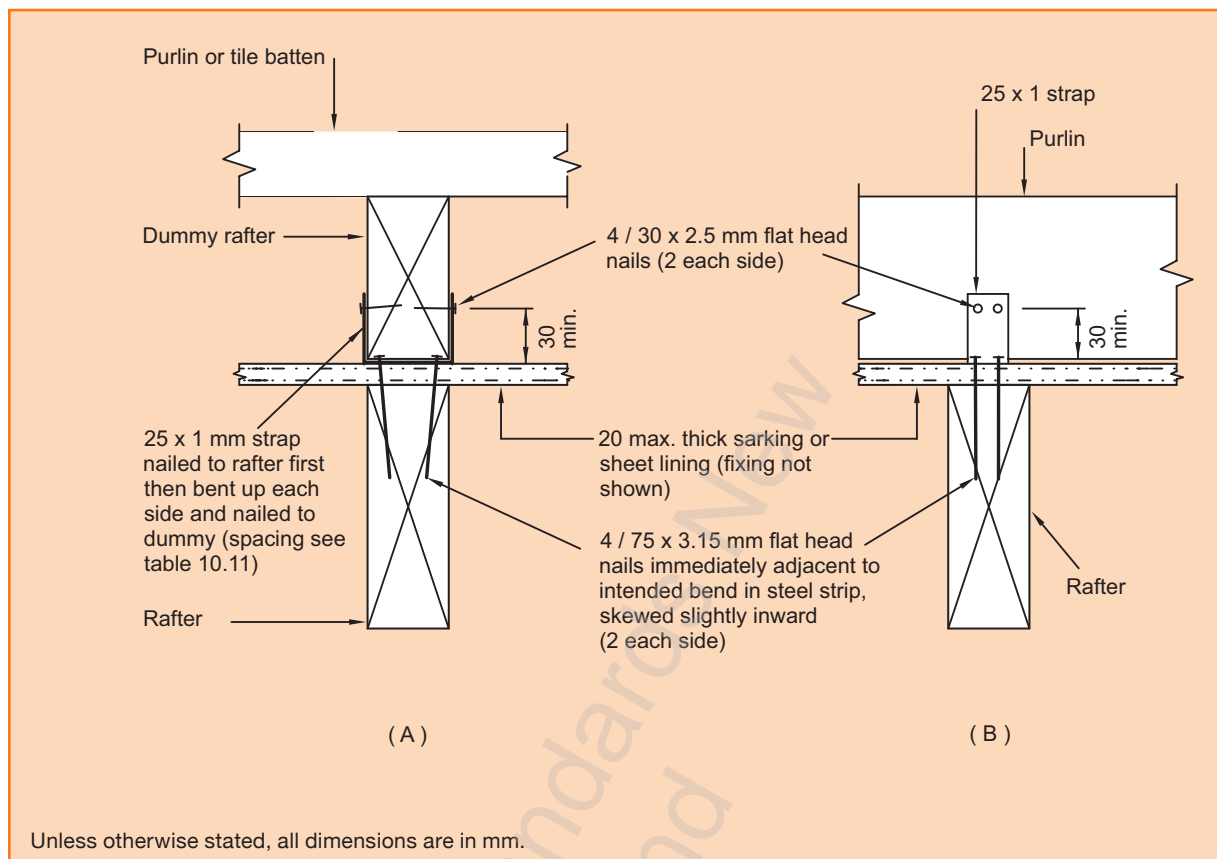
Fixing purlins and dummy rafters to sarked roofs (see 10.2.1.17.1)
